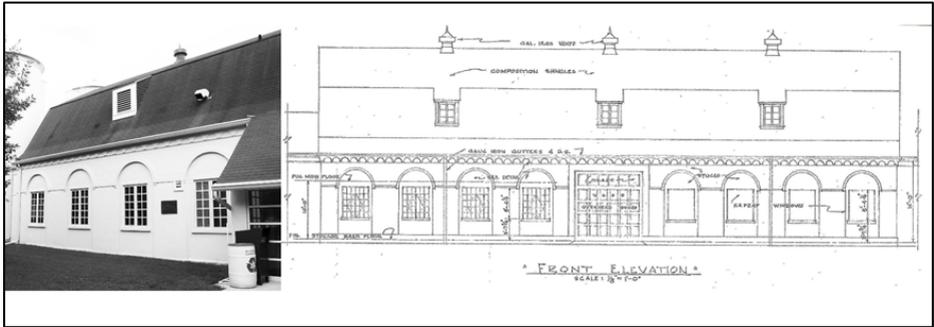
Excerpt from Four Towers (“Dairy Barn”) plan showing façade elevation.
